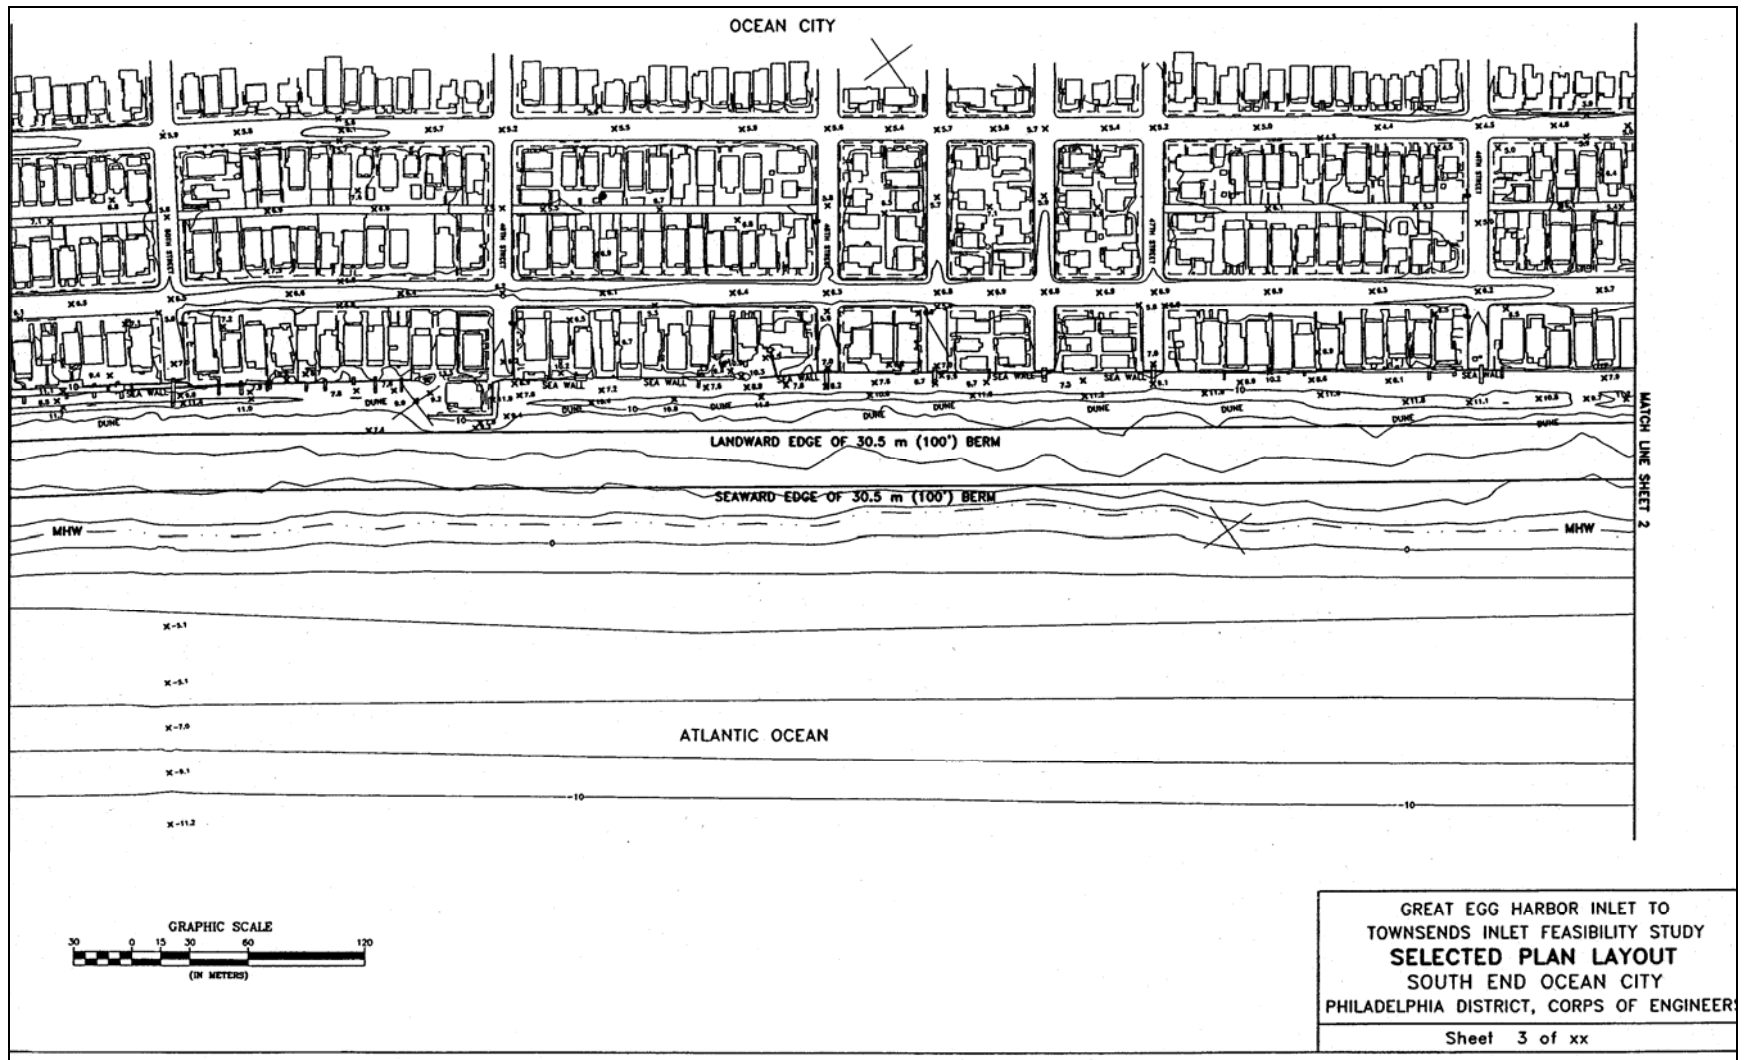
Selected Plan Layout for Ocean City, NJ – South of 45th Street to south of 50th Street
